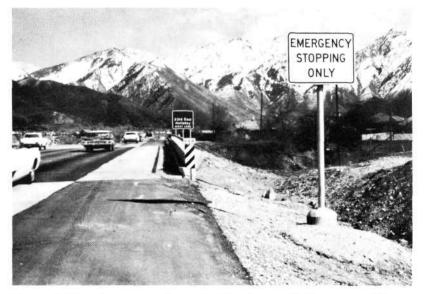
There is no approach guardrail in advance of this structure. The exposed concrete parapet wall is marked only by a reflectorized bridge panel. The sign message adds an ironic touch.
